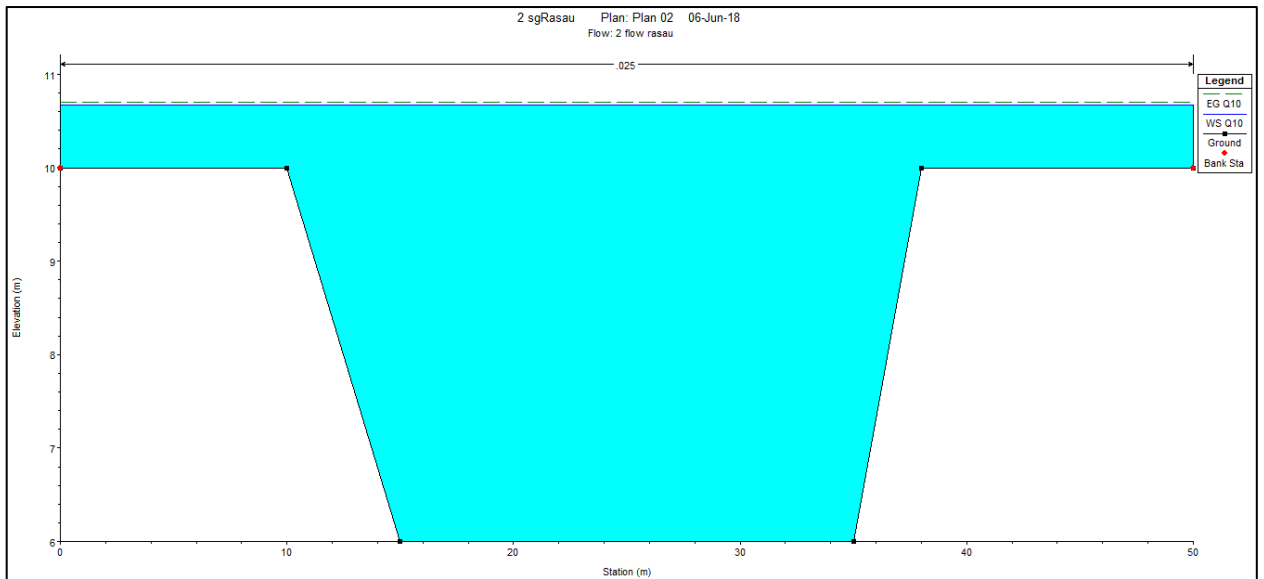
Water level at CH140 of Rasau River (with bridge piers) – Q_{10}
